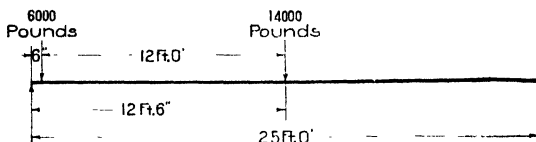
Position of Load for Maximum Shear at Center of Span. (See p. 703.)
